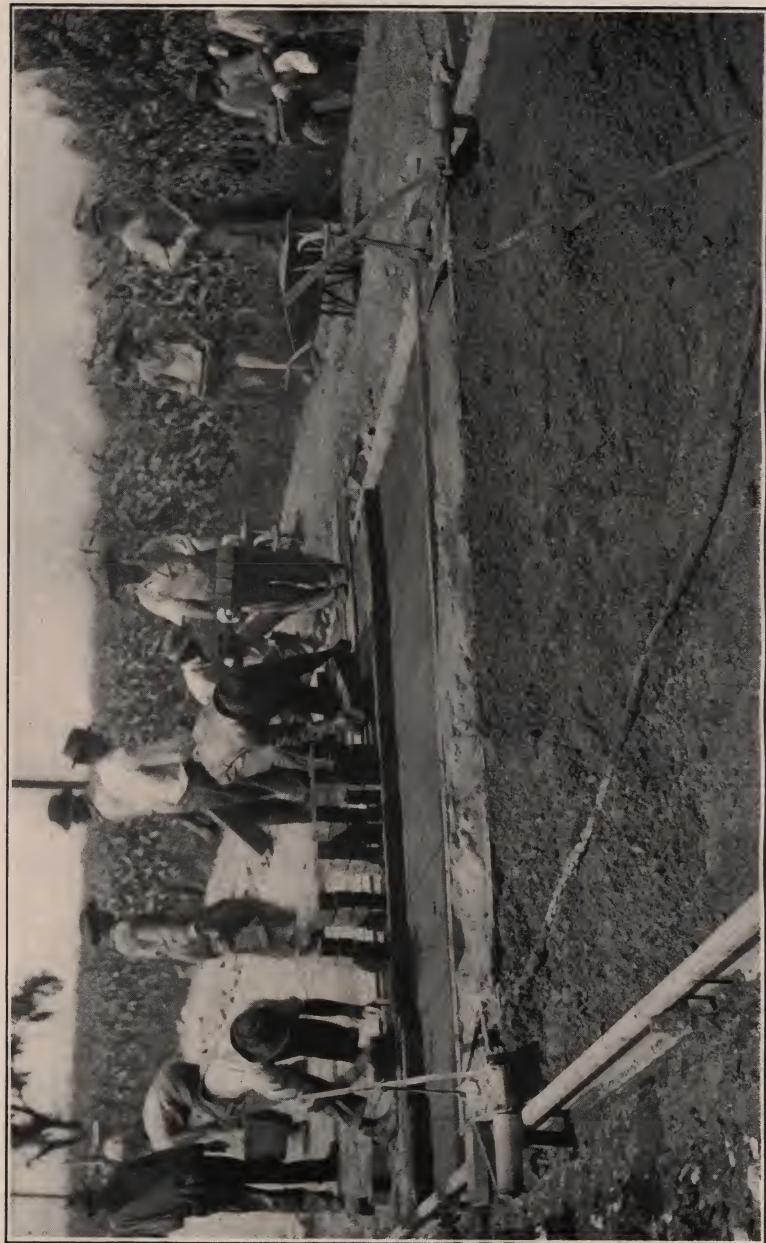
The Double Templed Foundation for Monolithic Brick Pavements.
